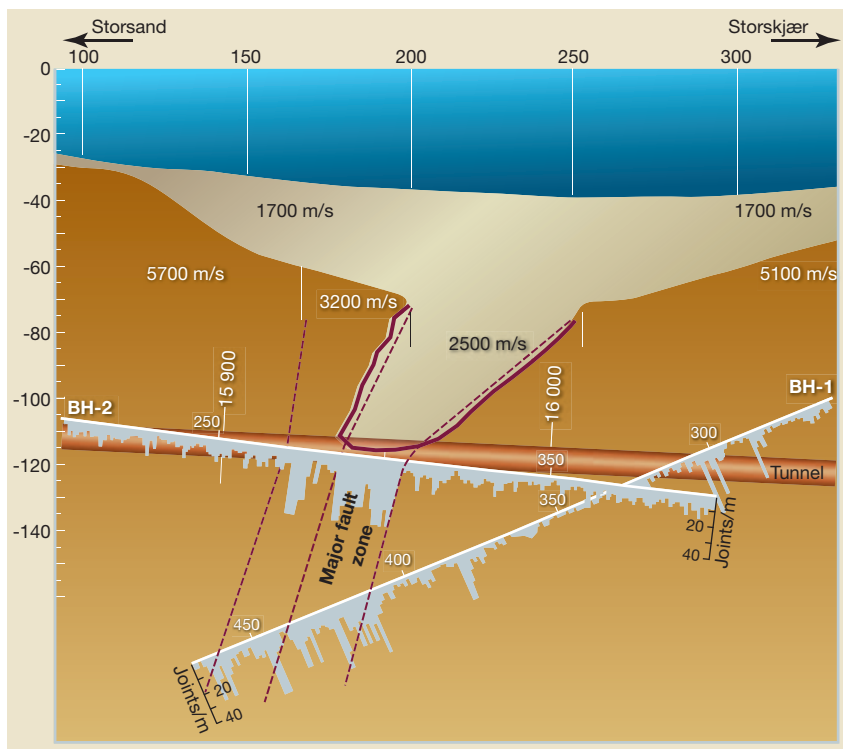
In construction of the Oslojord tunnel, the filled erosion channel was much deeper than expected as detected by probe drilling, necessitating a bypass tunnel
